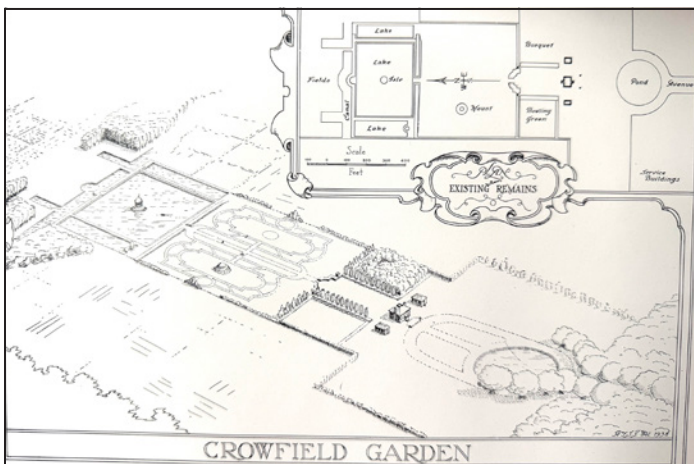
, Crowfield site plan, Augustine T. S. Stoney, 1938.
